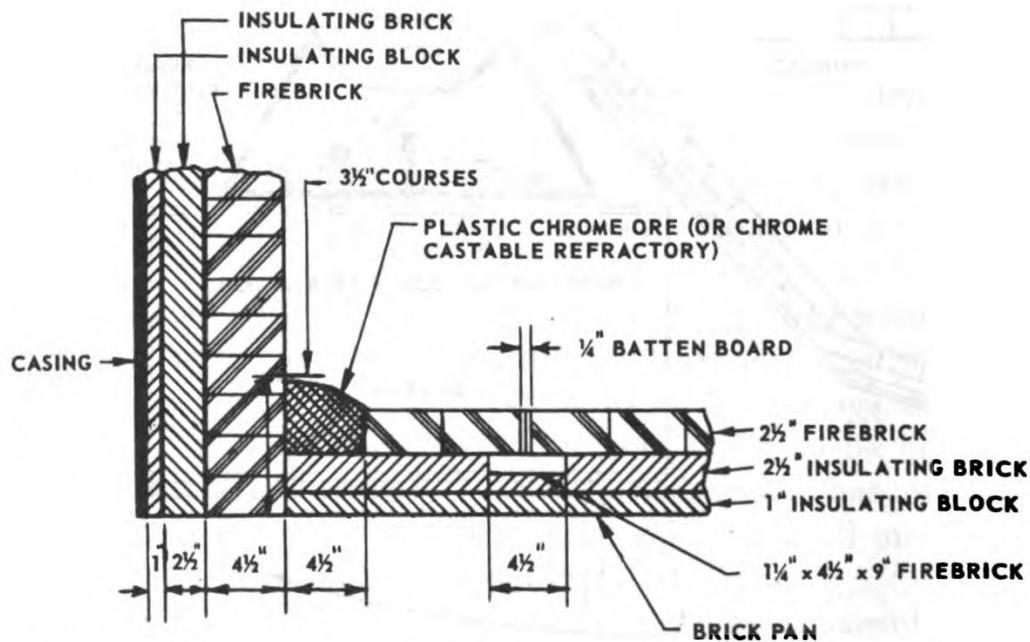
Refractory installation at junction of vertical wall and floor.
